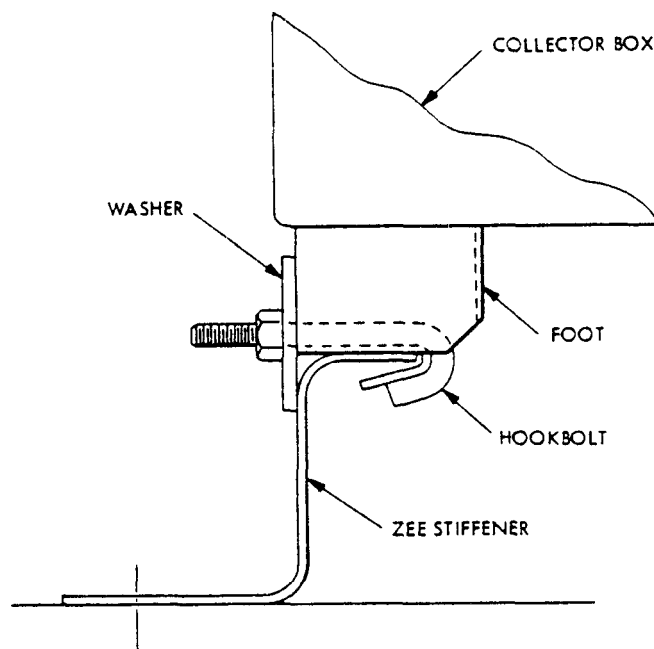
Collector Foot to Zee Stiffener Locking Assembly
